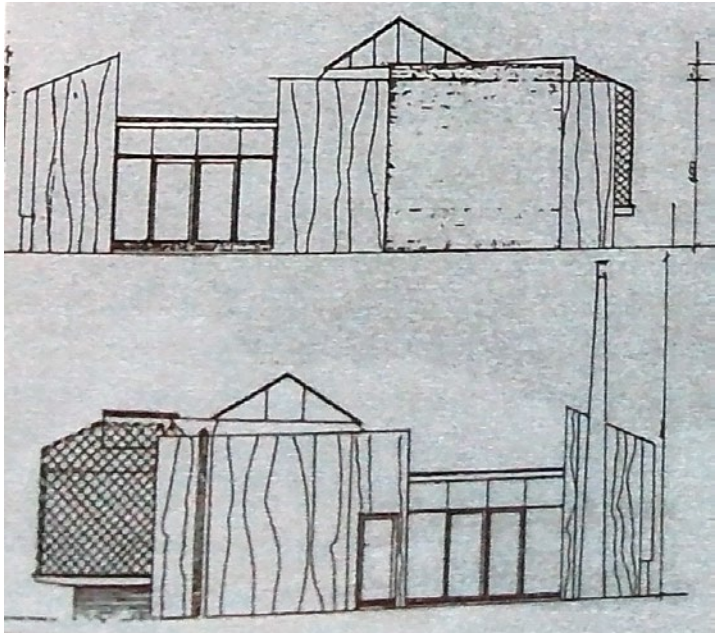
North-south elevations (Source: De Lucchi & Gaido).
